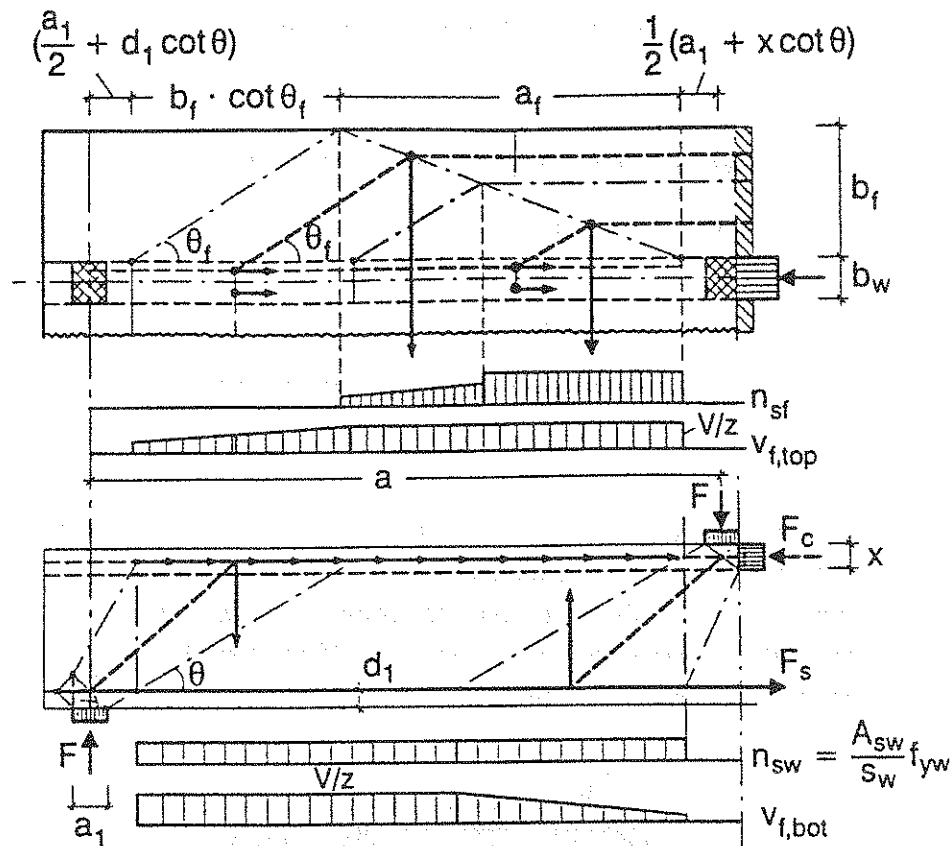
Truss model and stress fields for the transverse reinforcement of a compression flange
